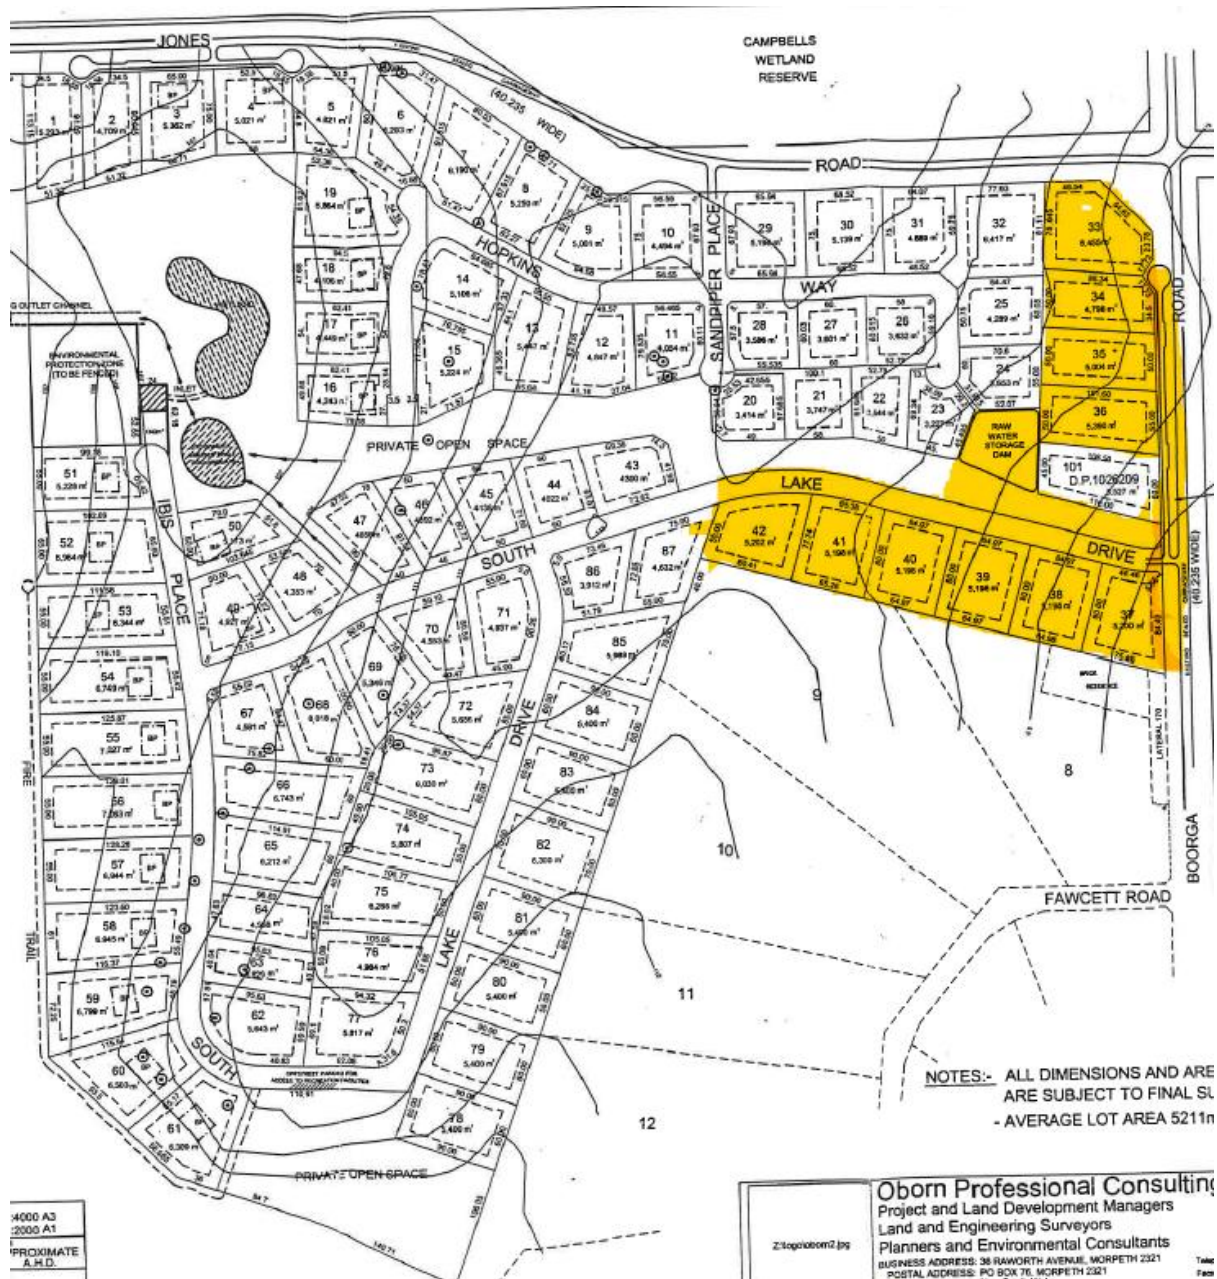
S38/1999(1) Stamped plan extract – Stage 1 lots registered (yellow highlight)
